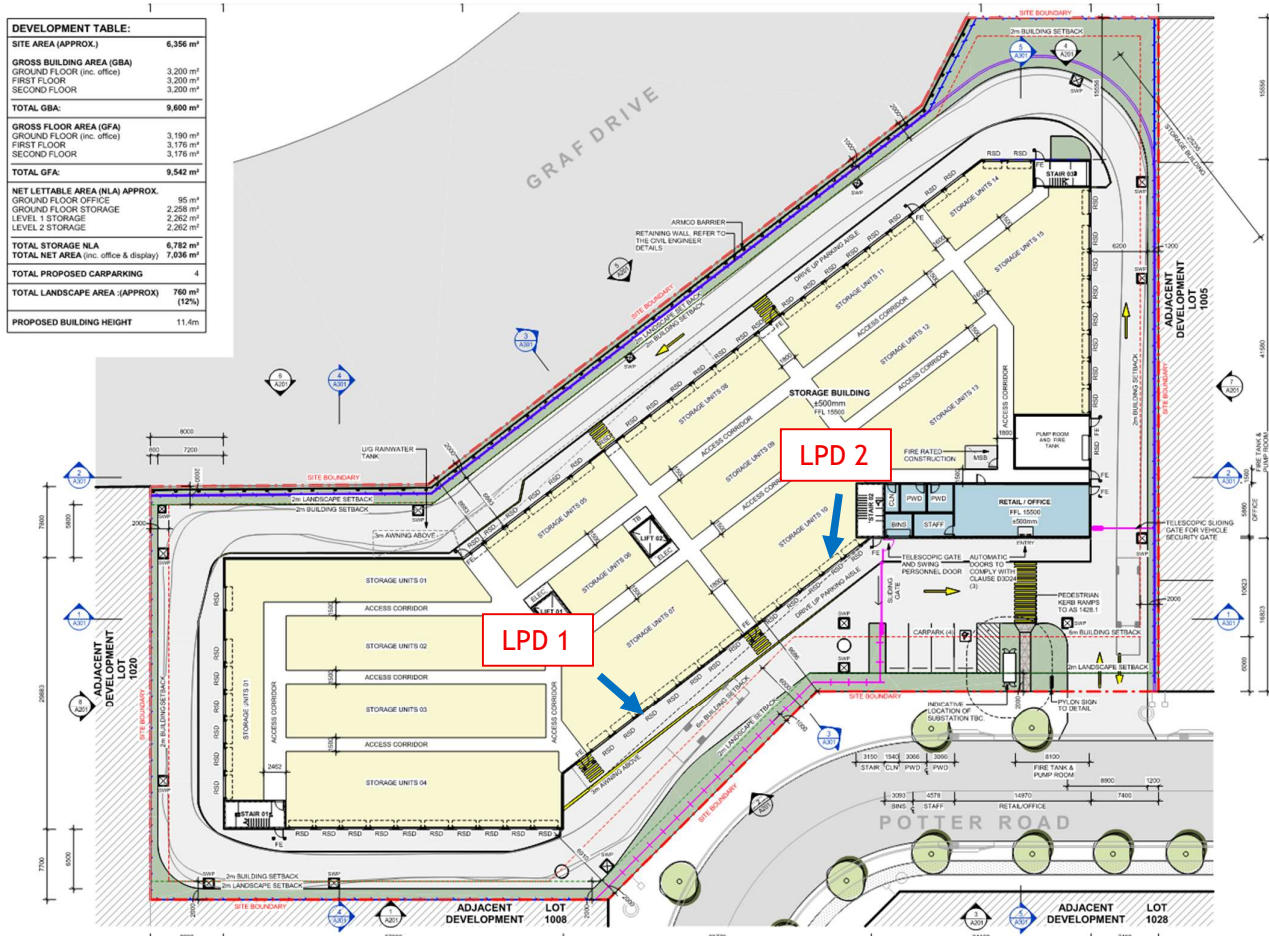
Proposed Site Plan (Source: Reid Campbell Architects)
